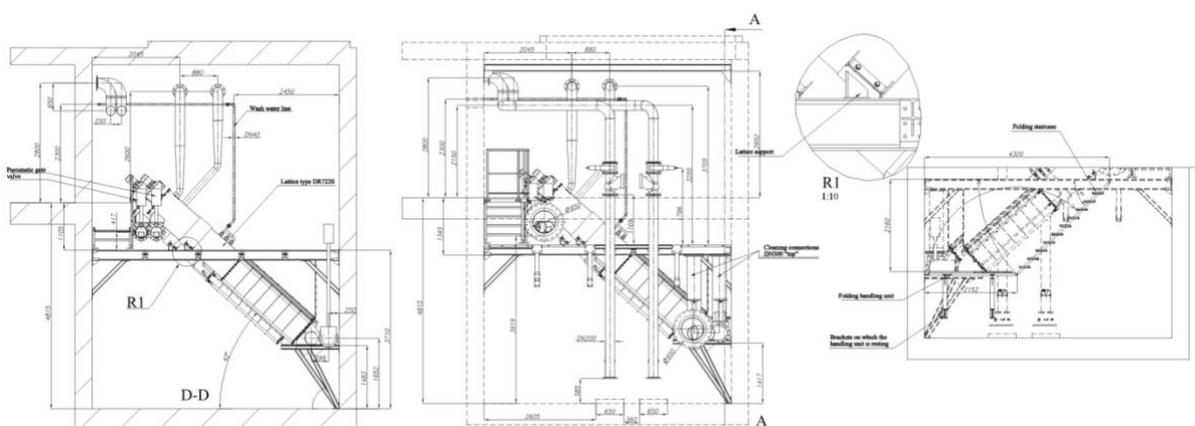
Budapest Demo site: installation design sewage shaft chamber
